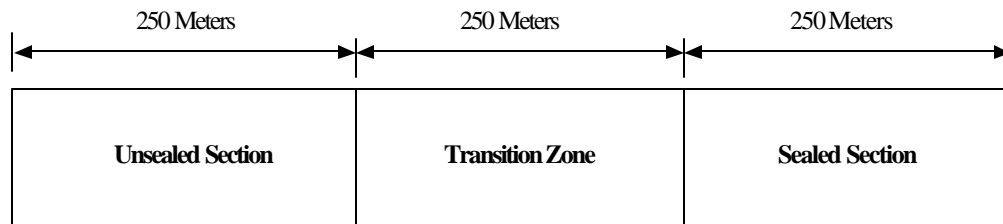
Plan View of Typical Project Location With Test Sections Identified
